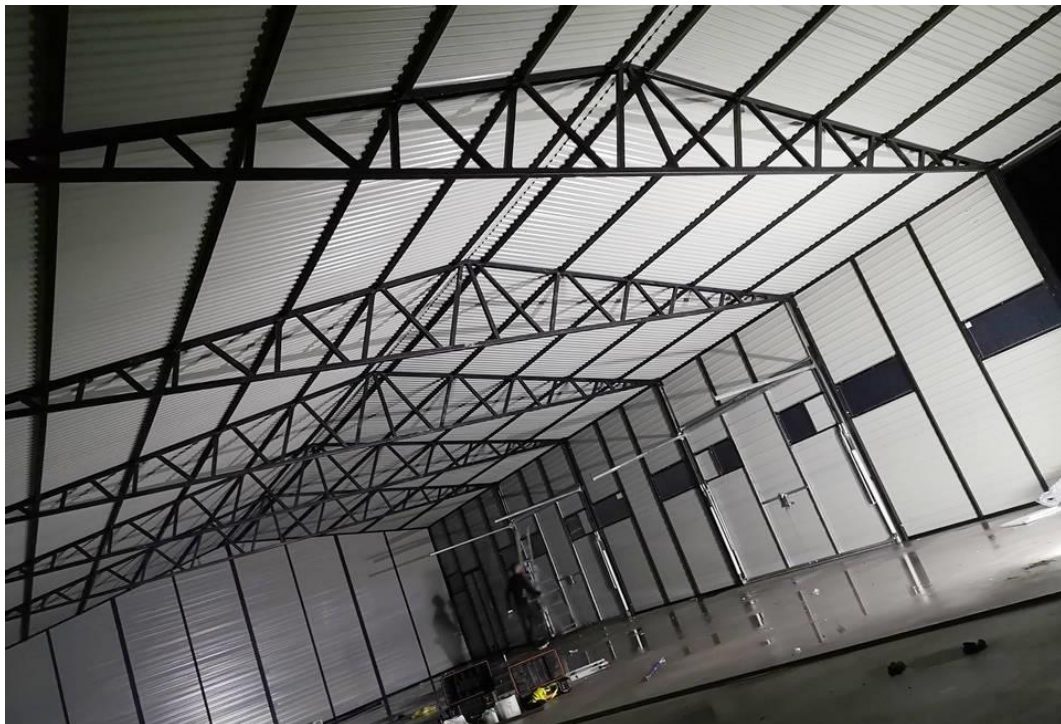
Construction diagram for a sample hall with lattice girder (source: [2])
